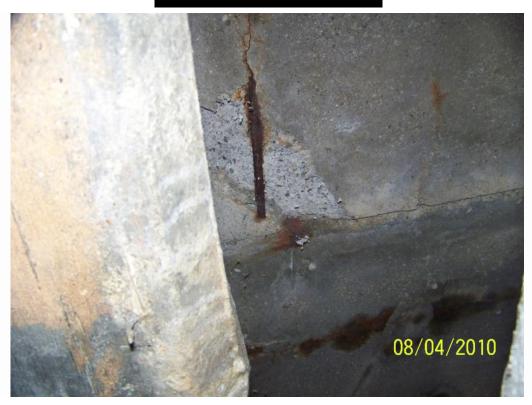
Spall to the underside of the South concrete sidewalk, in span #1.
